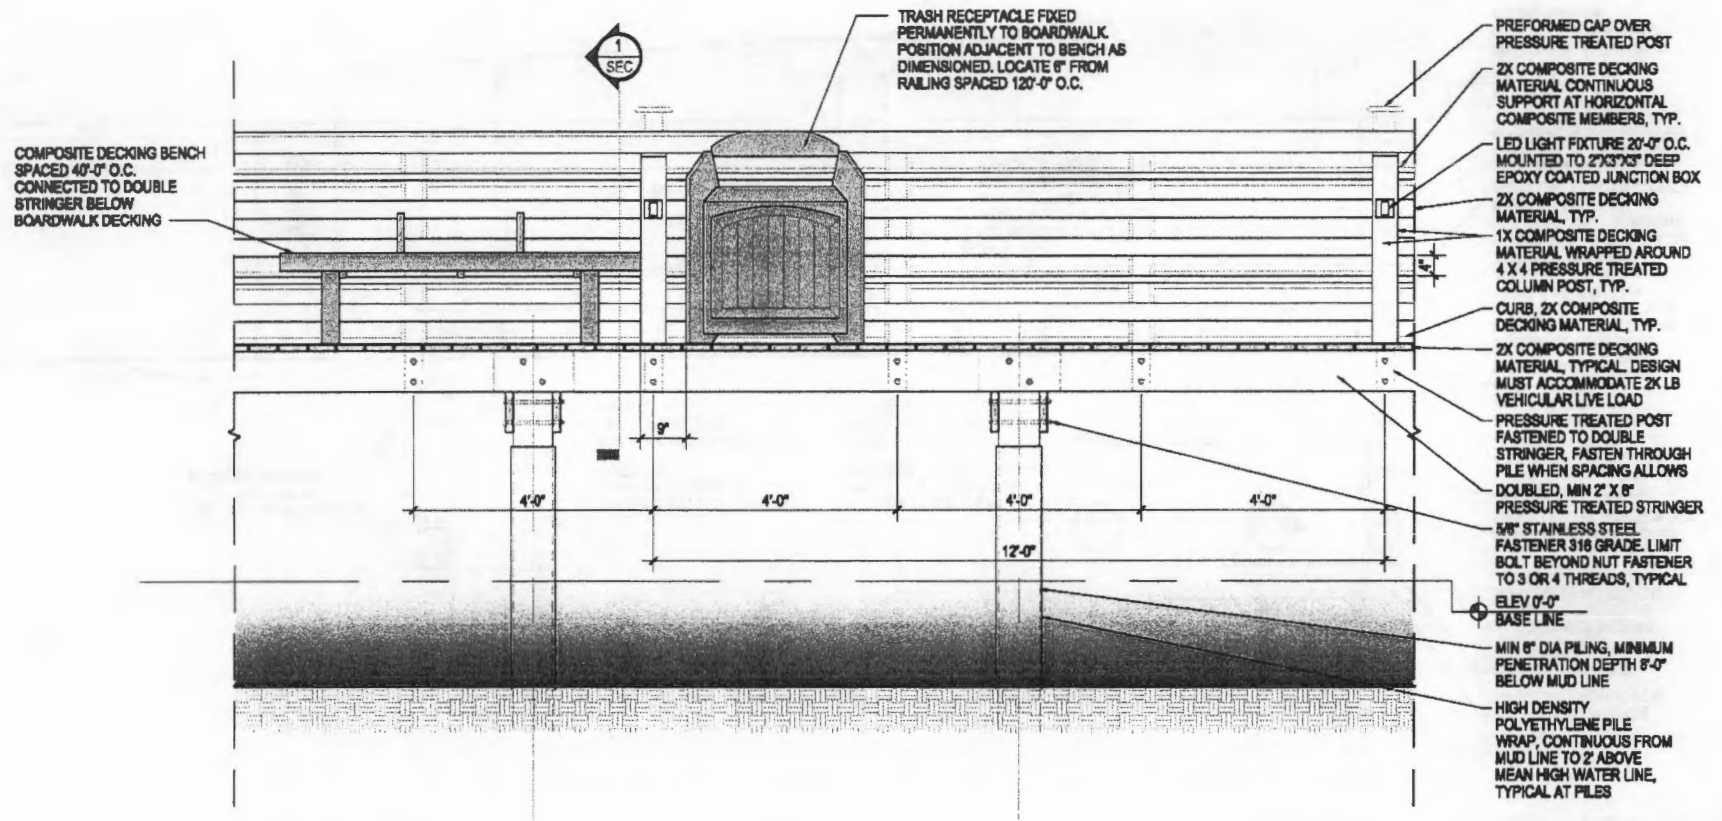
Typical Boardwalk Railing Elevation at 1/2" = 1'-0" Scale
